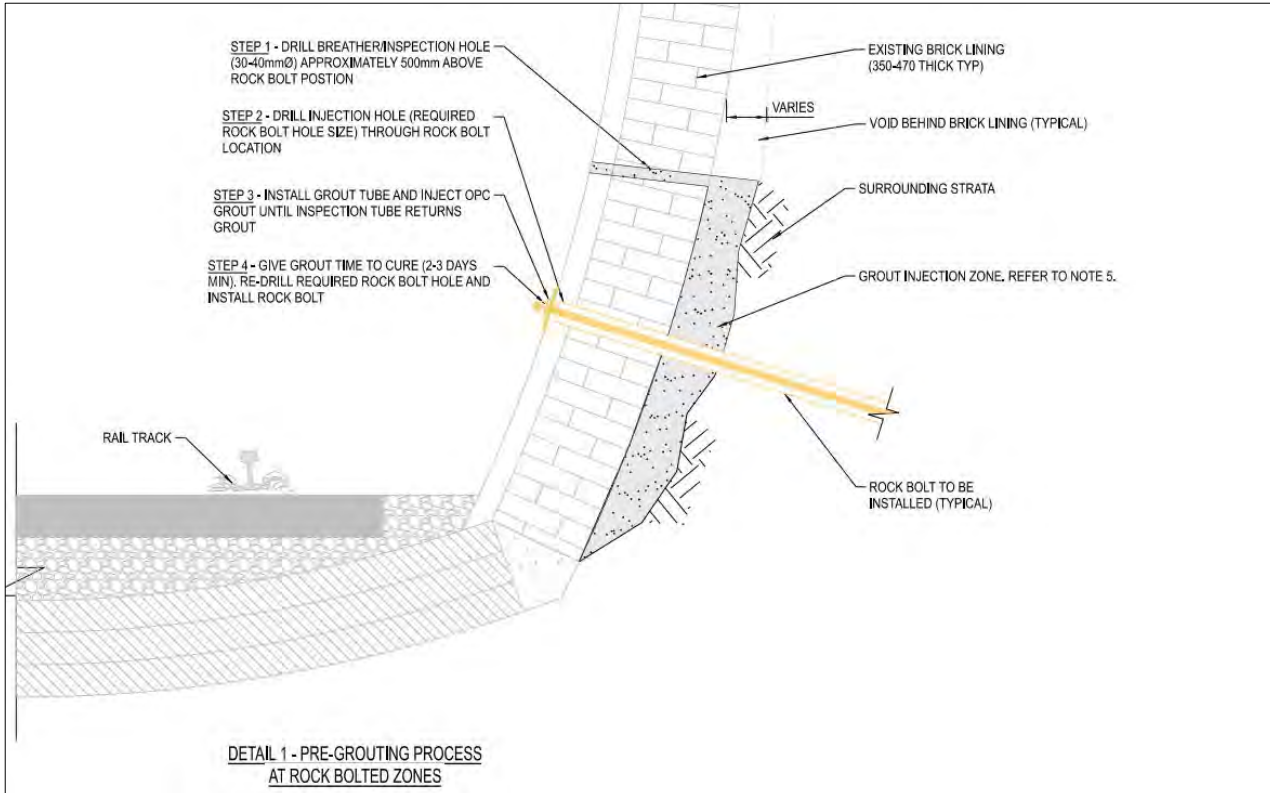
TYPICAL SECTION SHOWING PRE-GROUTING PROCESS AT ROCK BOLTED ZONE. (SOURCE: AURECON/VLINE)
